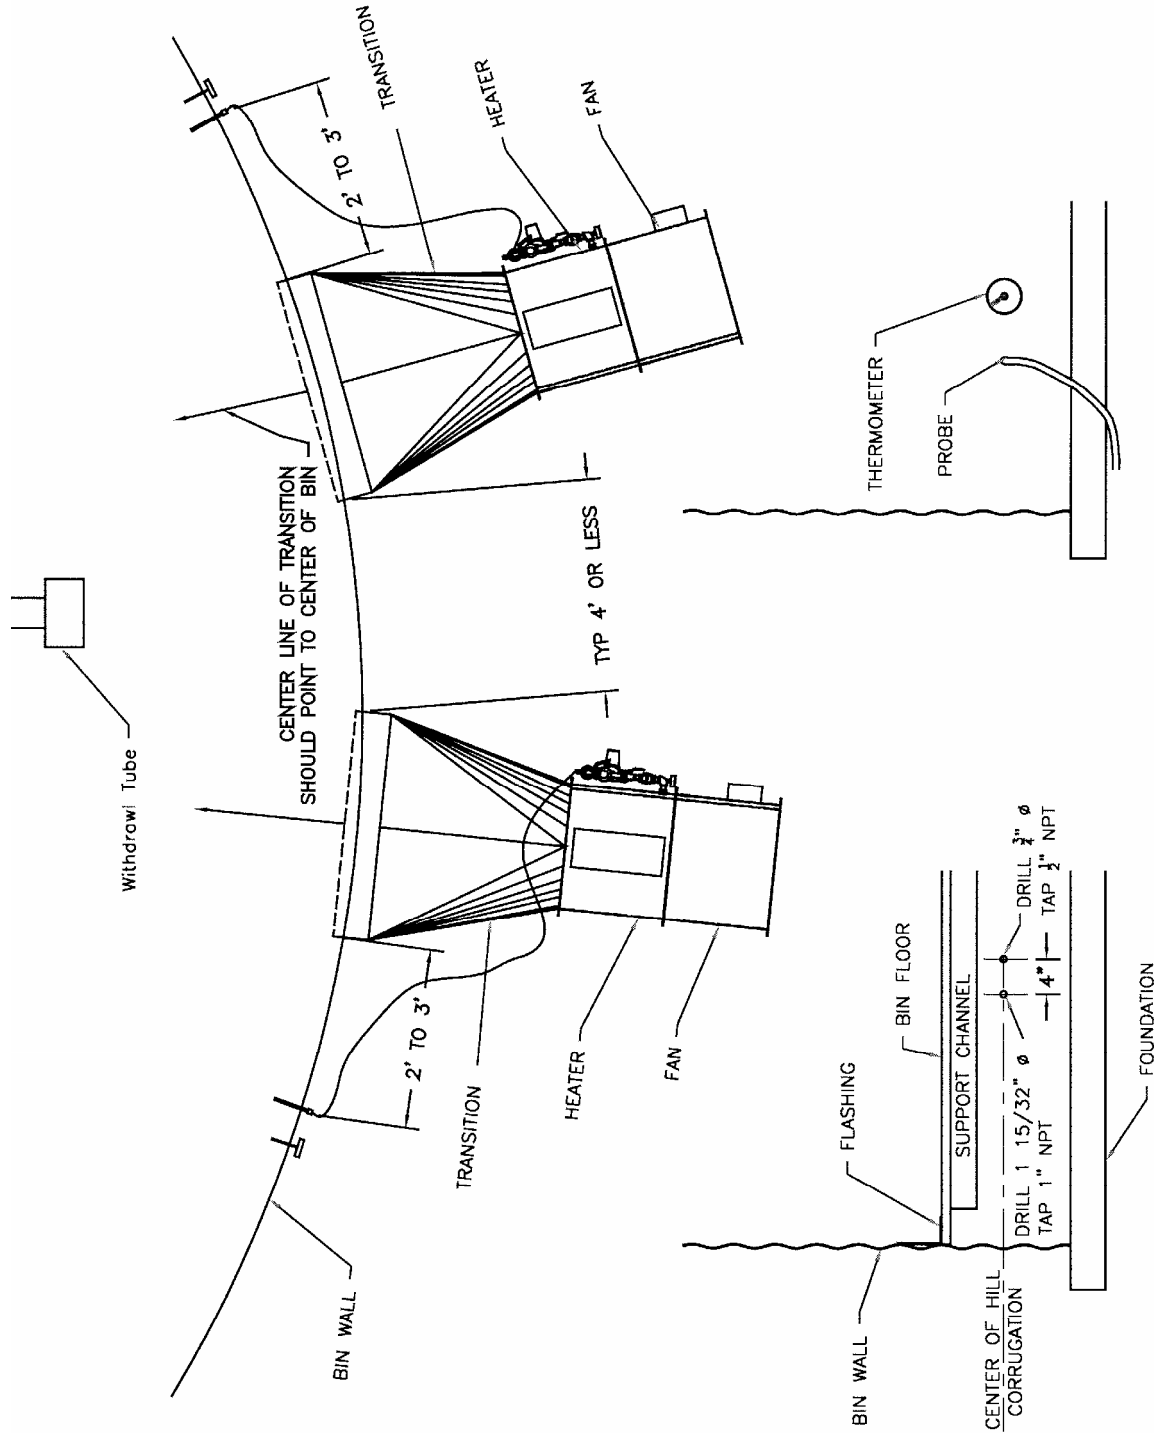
HEAT SENSOR AND THERMOMETER LOCATION FOR TWO HEATERS EACH WITH A MODULATING VALVE
